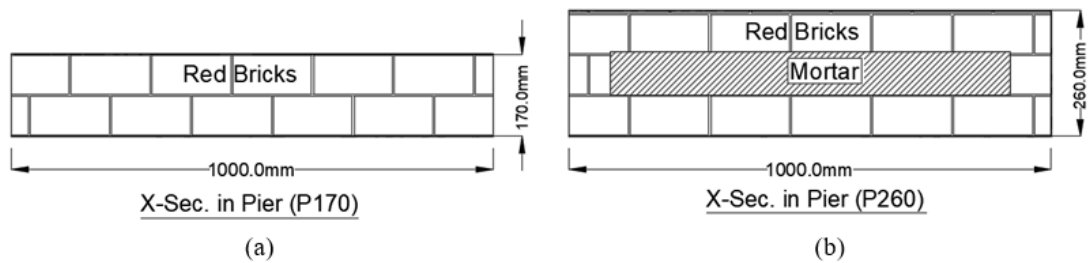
Cross Sectional Area of Examined Piers a) P170, and b) P260
